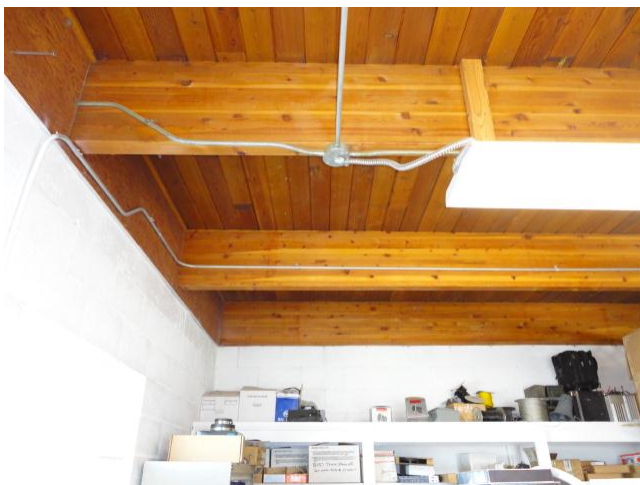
Install surface mounted conduits to glu-lam beams (to match existing) and down CMU walls as necessary (to match existing). Install three (3) surface mounted duplex outlets on CMU walls in Radio Shop as shown on drawing.
